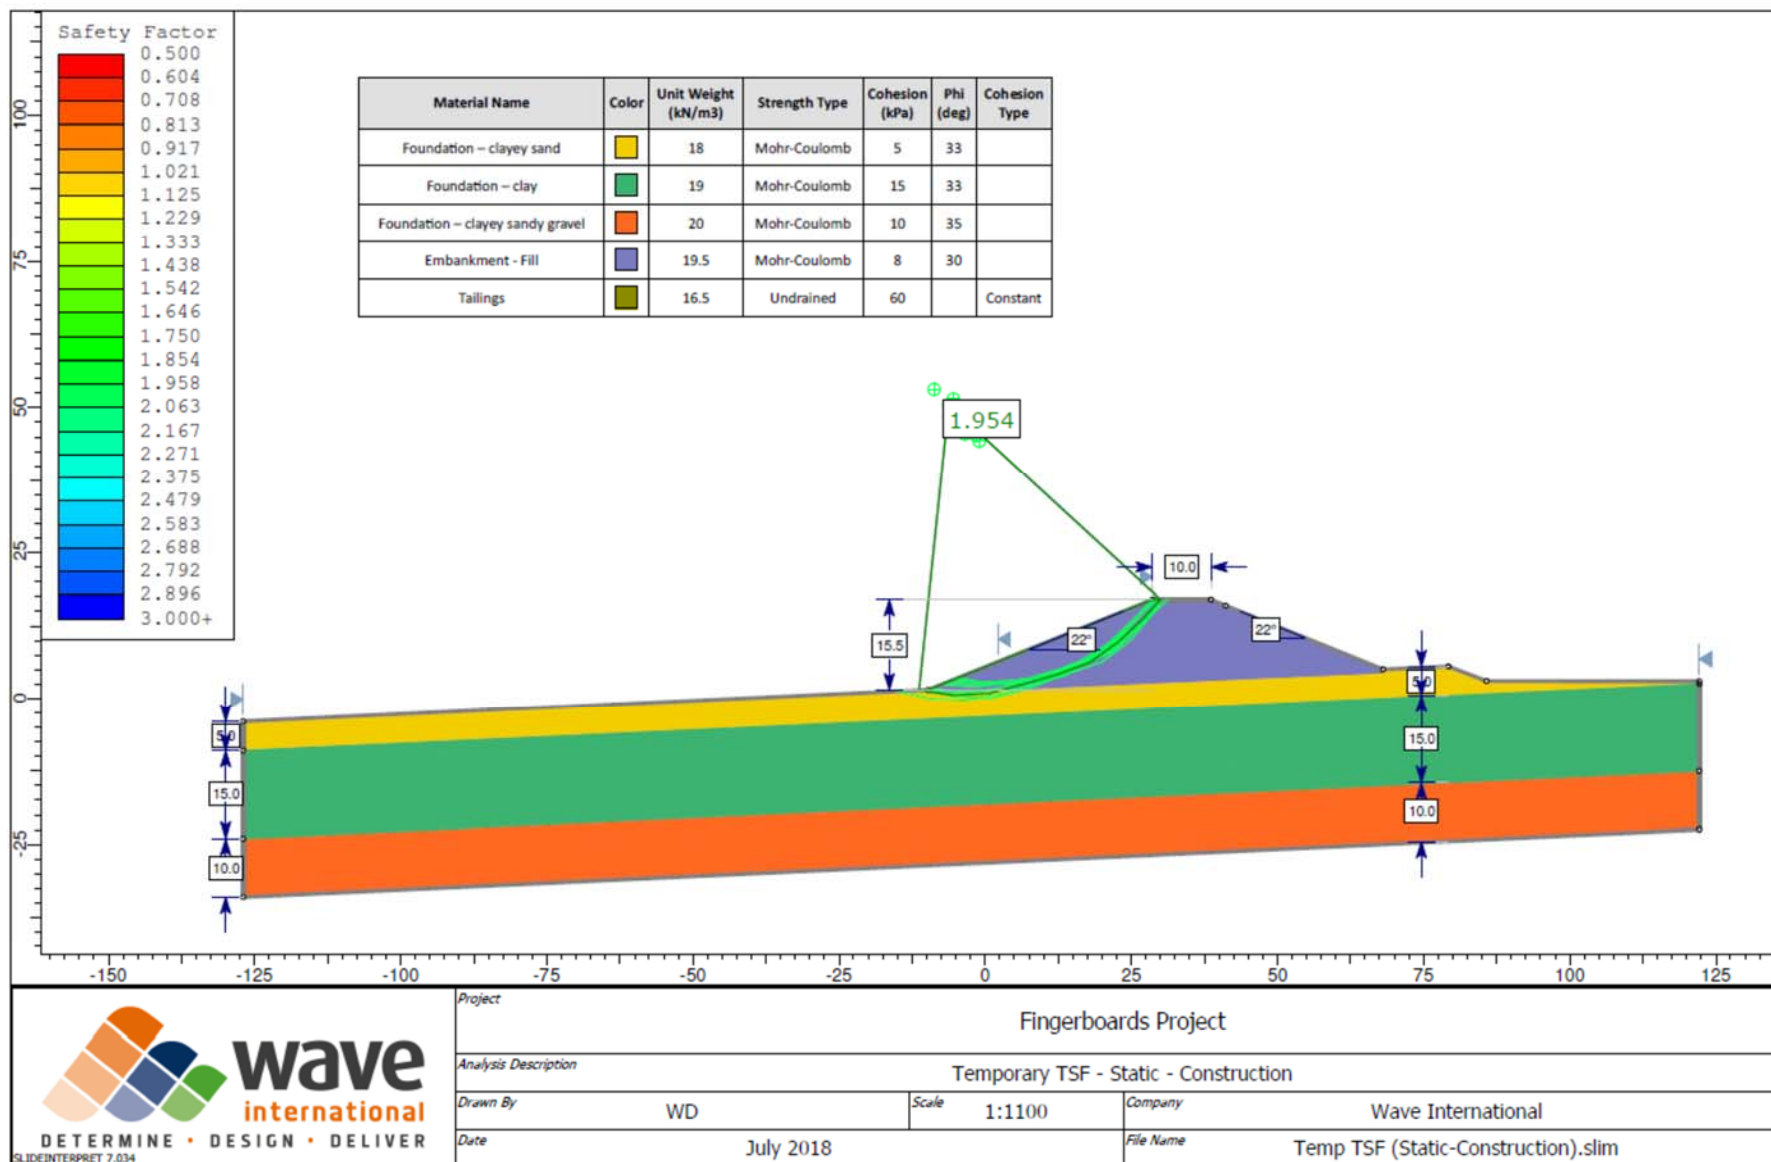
Temporary TSF – Static Construction (downstream slope)
